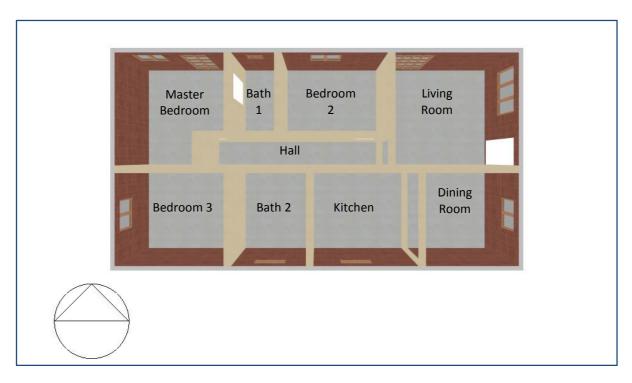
DESIGNBUILDER REFERENCE BUILDING (LAYOUT)
